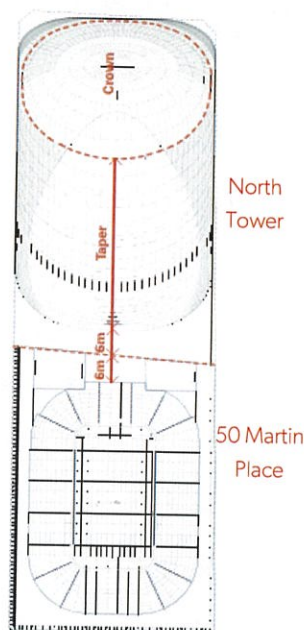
| Roof plan showing tapering curves of the proposed tower (Source: Applicant's RtS)
